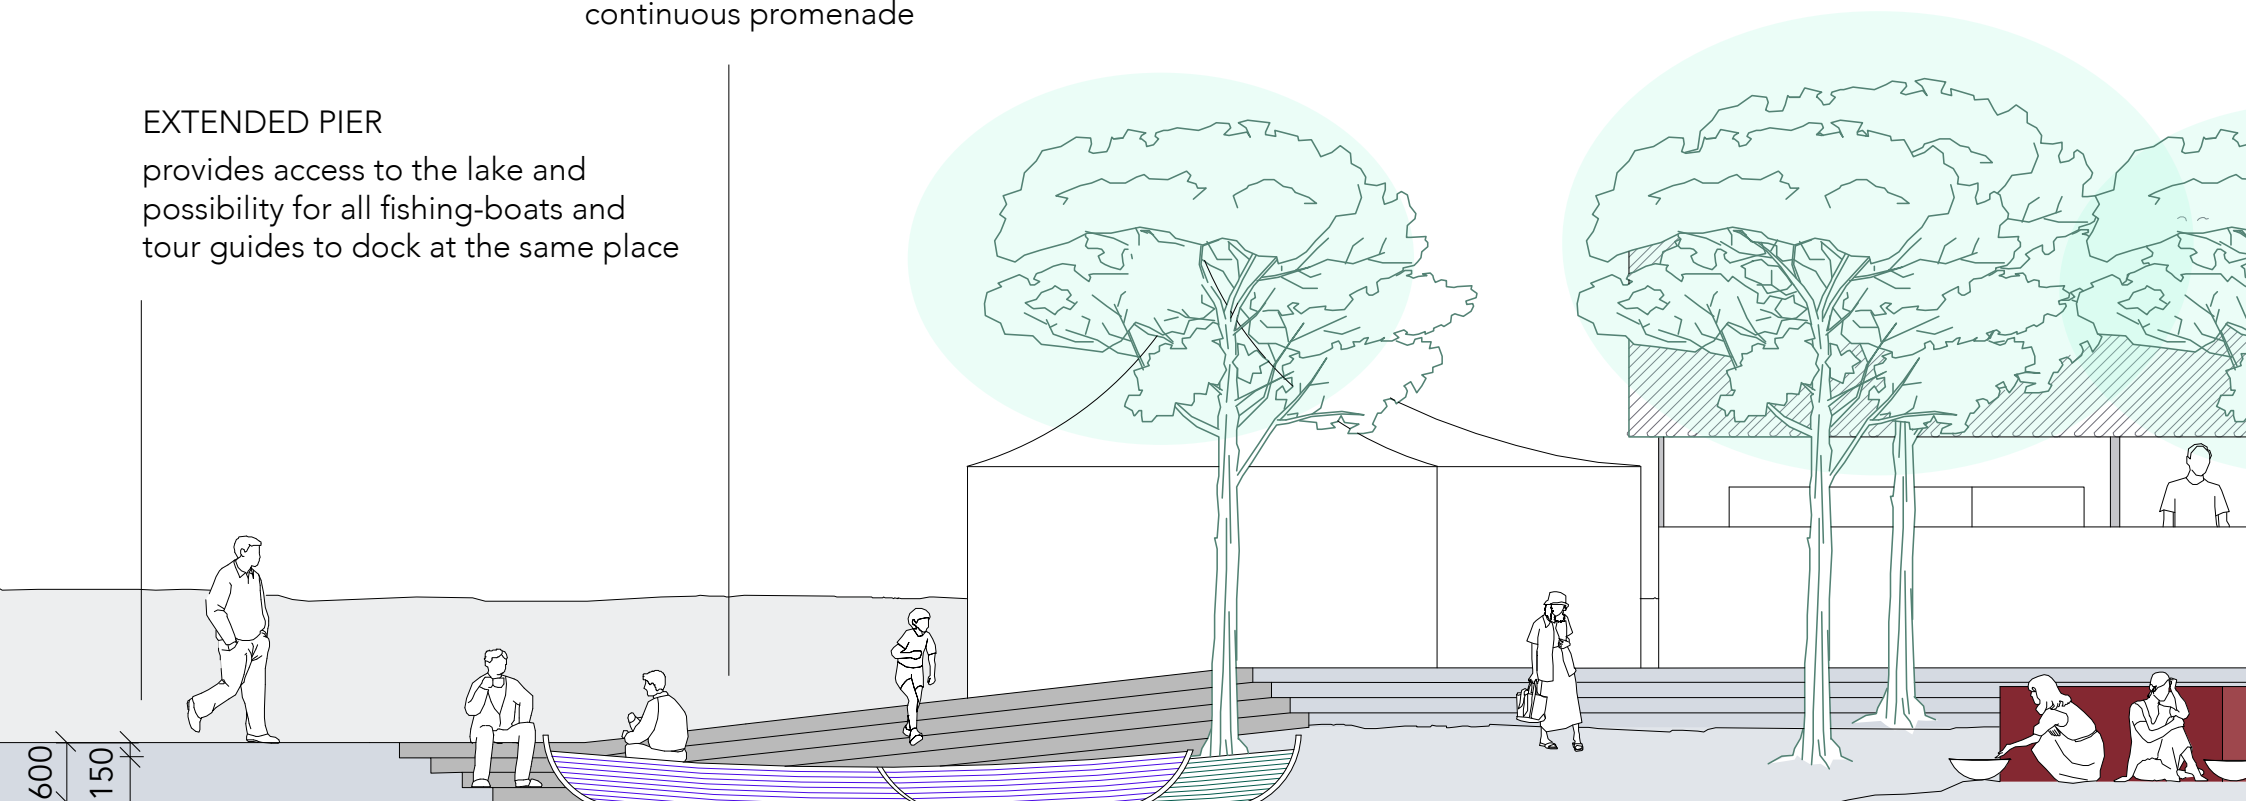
Section A-A over Dunga, showing the pier, fish market and wetlands
